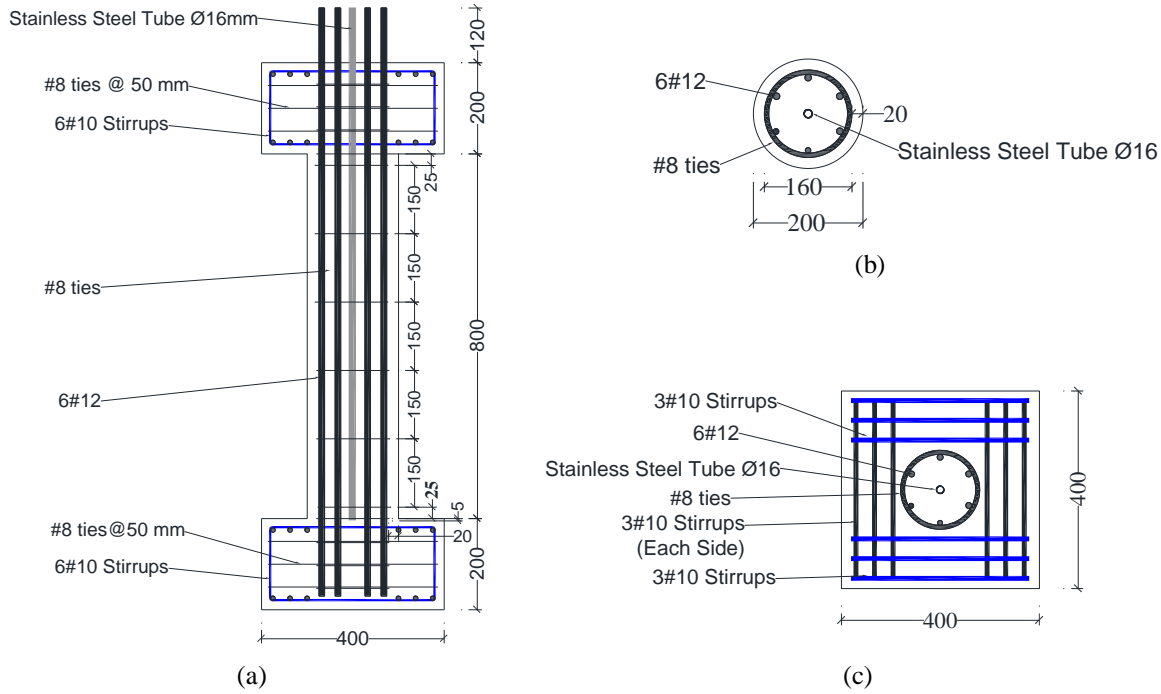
A schematic showing details of a typical test specimen: (a) longitudinal section; (b) column's cross-section; (c) end-stub's cross-section (dimensions are in mm).
